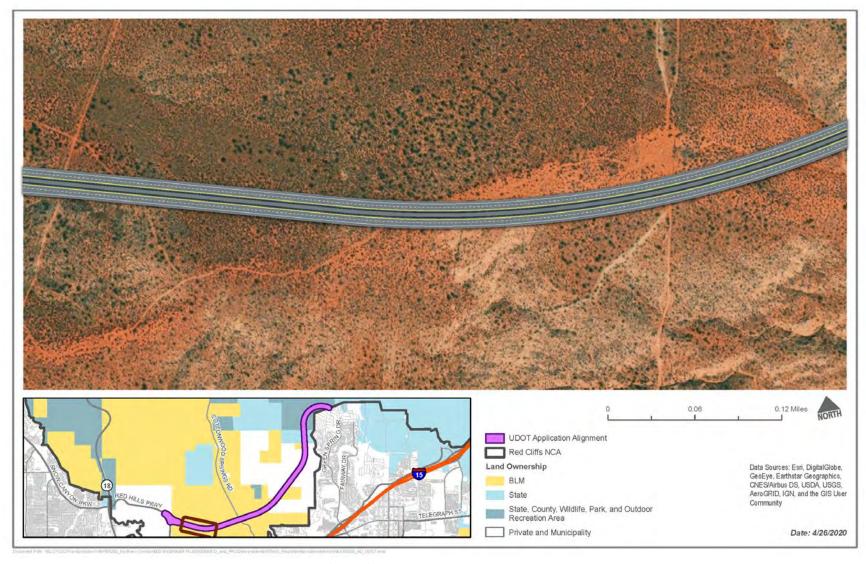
UDOT Application Alignment Plan View (2 of 9)
